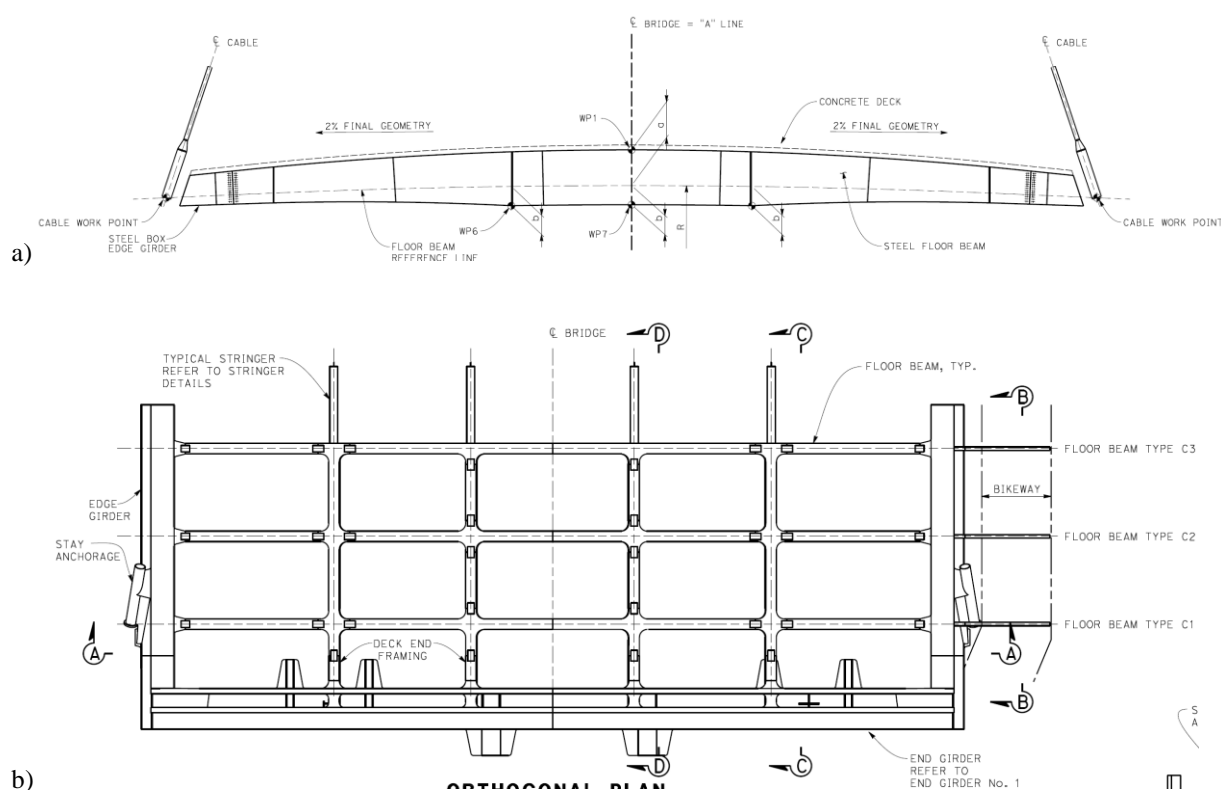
Main Span superstructure a) section view b) orthogonal plan view
